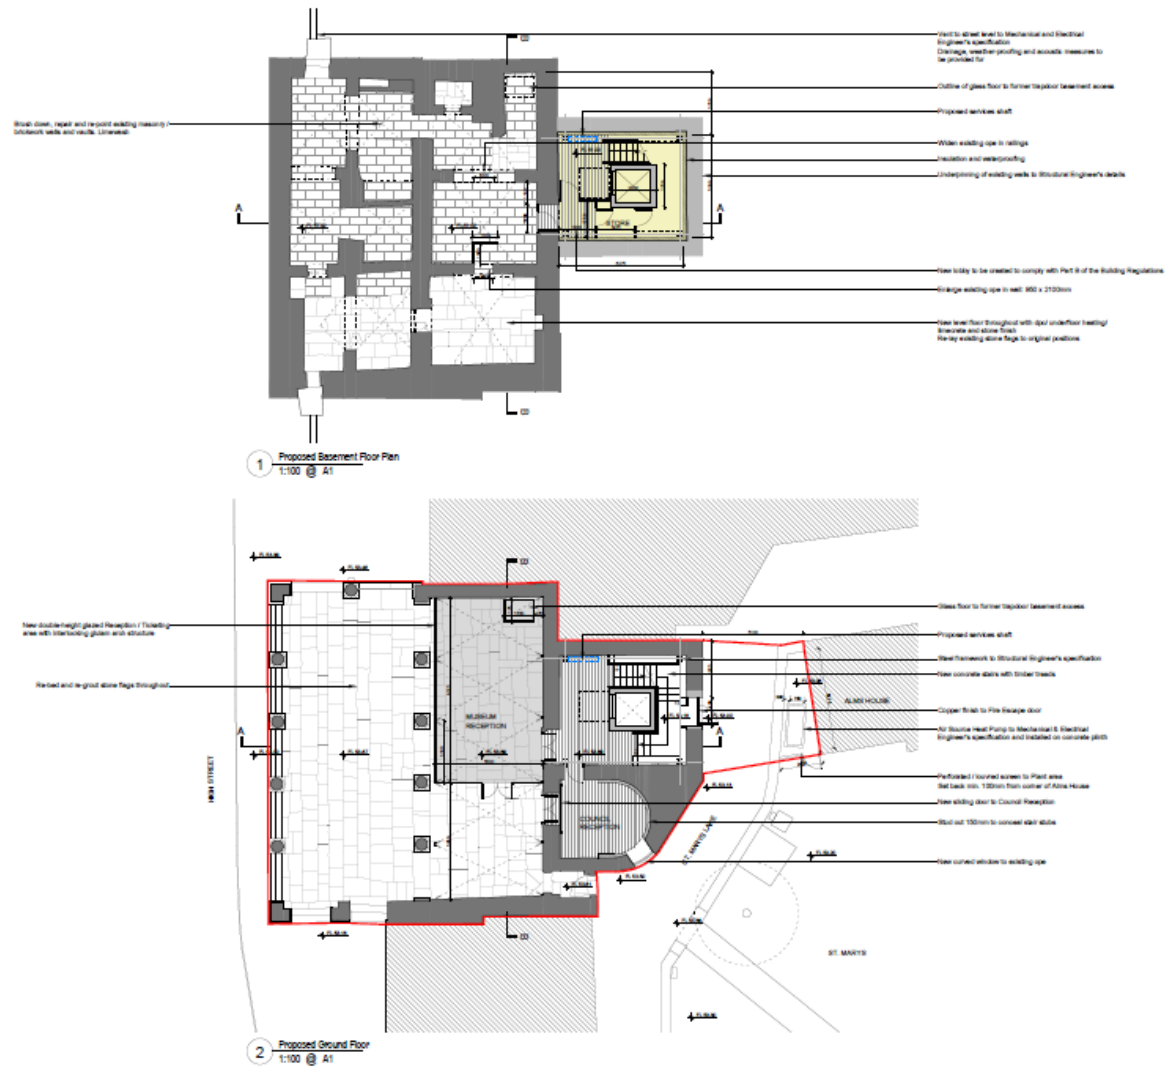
Proposed development layout Basement and Ground Floor levels (Reddy Architecture and Urbanism)
